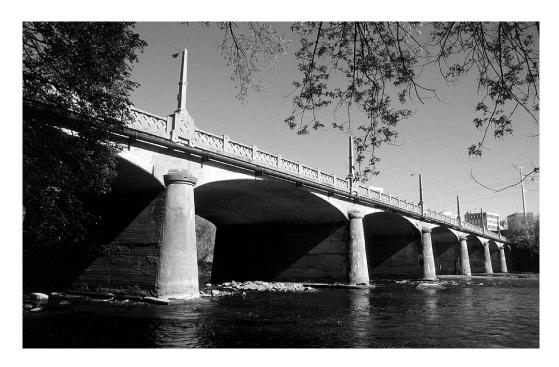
Concrete Closed Spandrel Arch with Decorative Concrete Elements;
